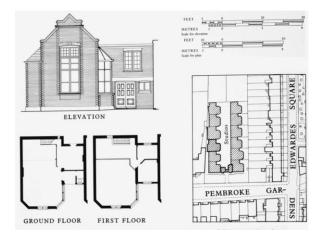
Pembroke Studios, site plan, and typical studio plan and elevation. C. F. Kearley, builder, 1890–1
